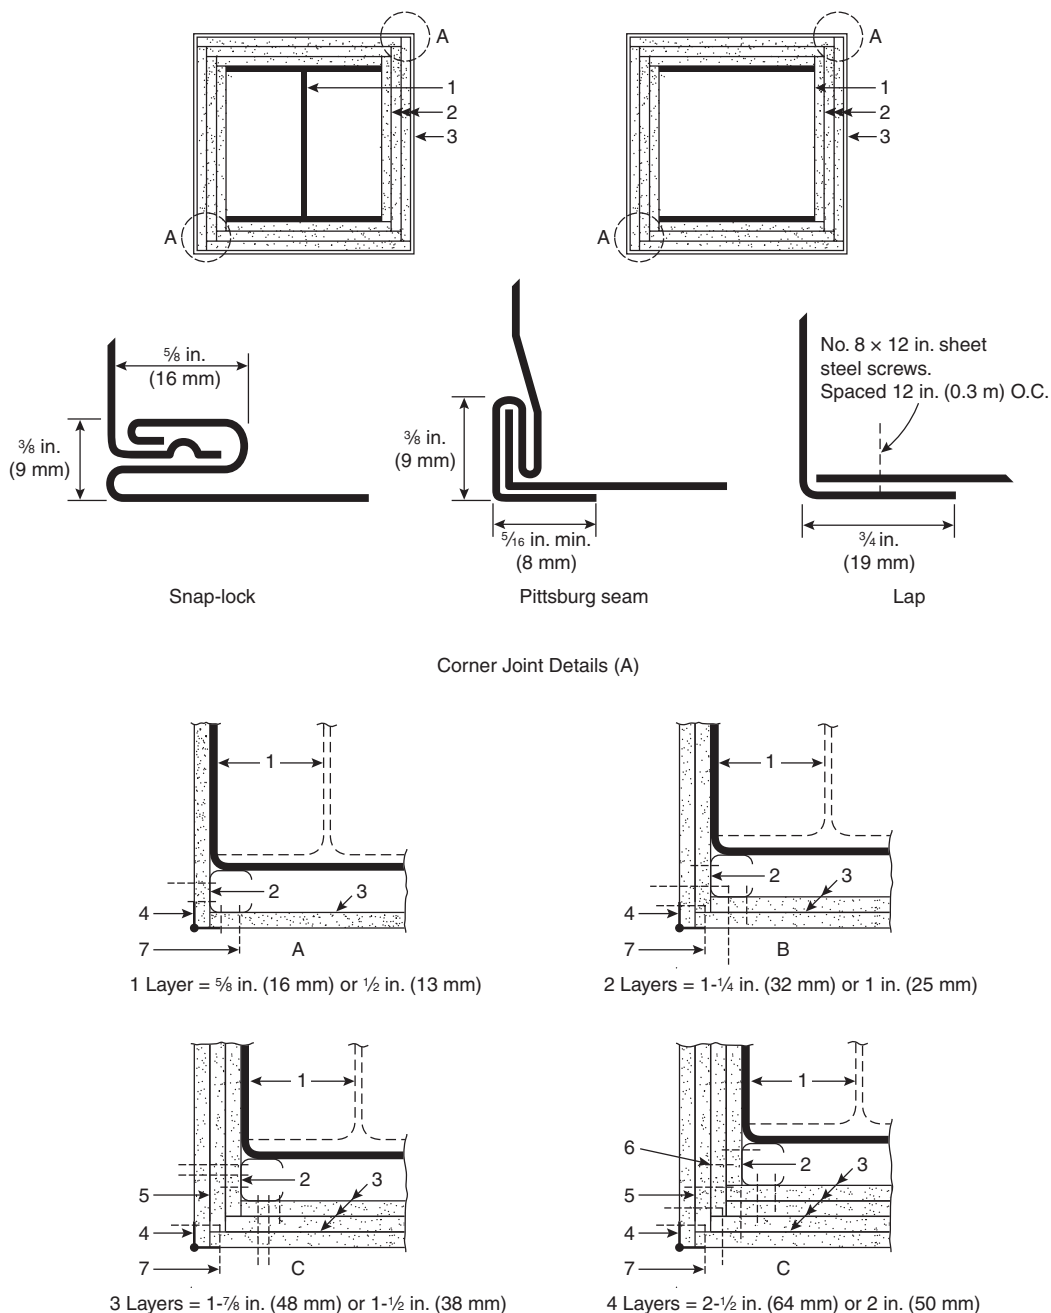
Attachment mechanisms of gypsum wallboard to steel columns.<sup>25</sup>
